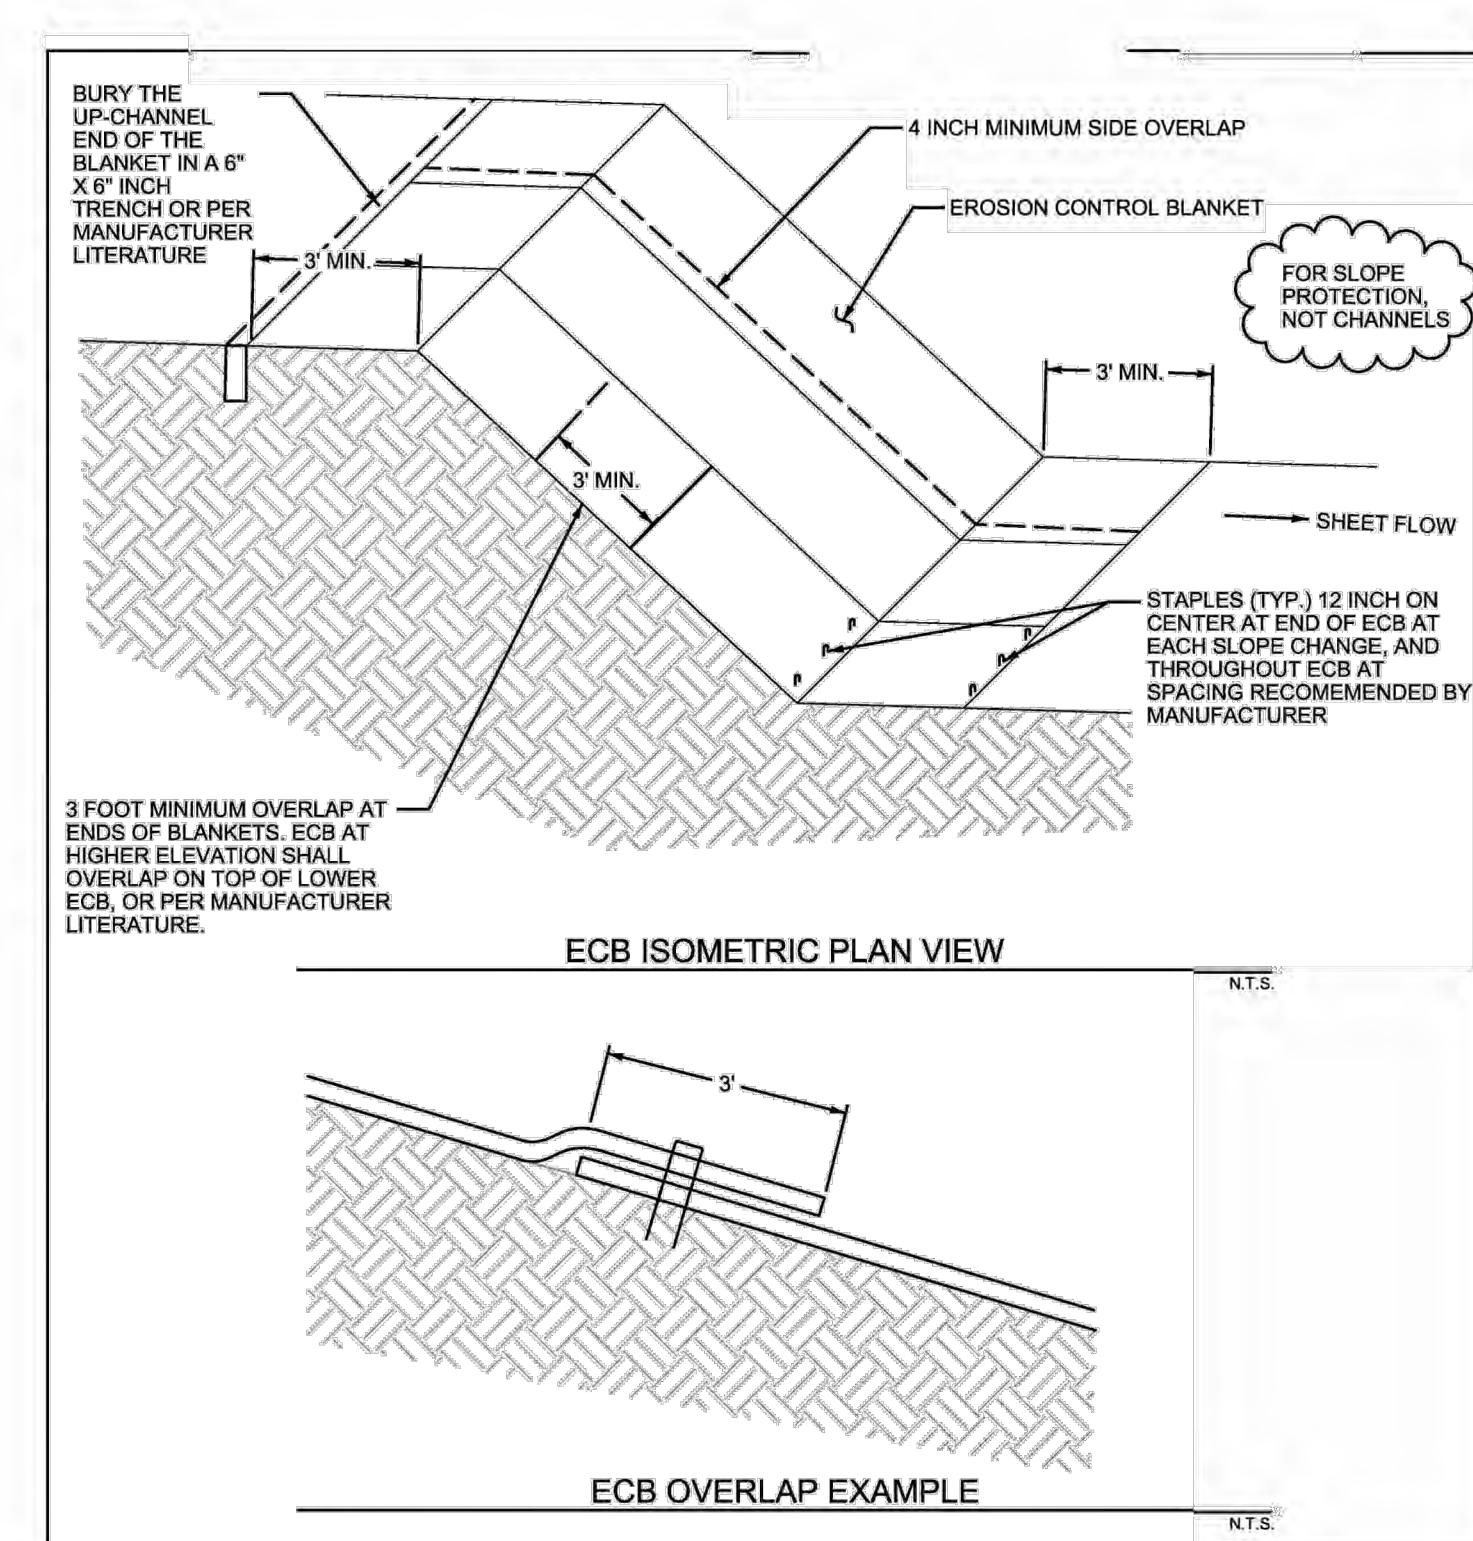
STANDARD CONSTRUCTION DETAIL -
